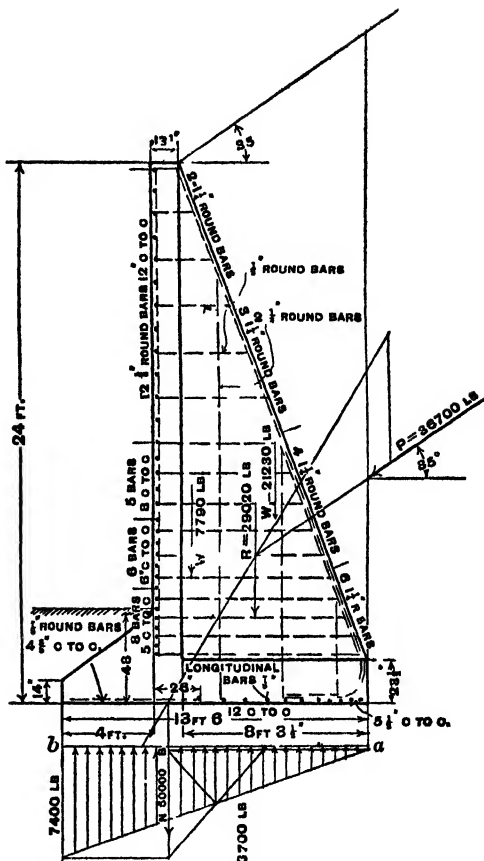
Design of Retaining Wall with Counterforts (See p 671)
